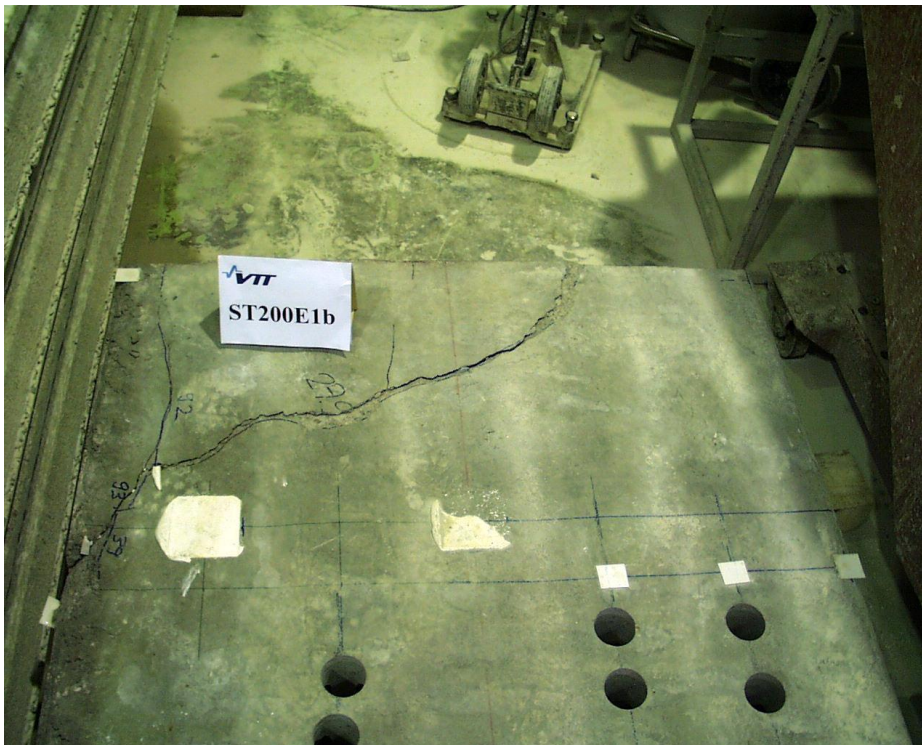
ST200E1b. Cracking pattern in top flange.
